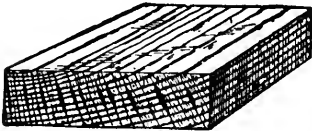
"Honeycombed" Board. The checks or cracks form along the pith rays.
